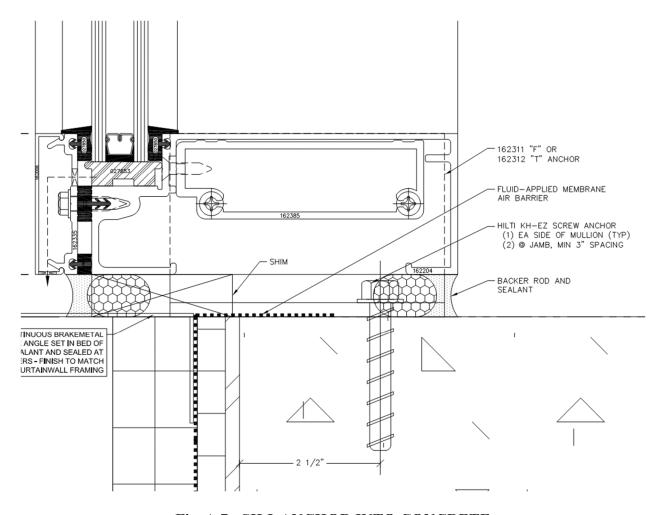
SILL ANCHOR INTO CONCRETE
